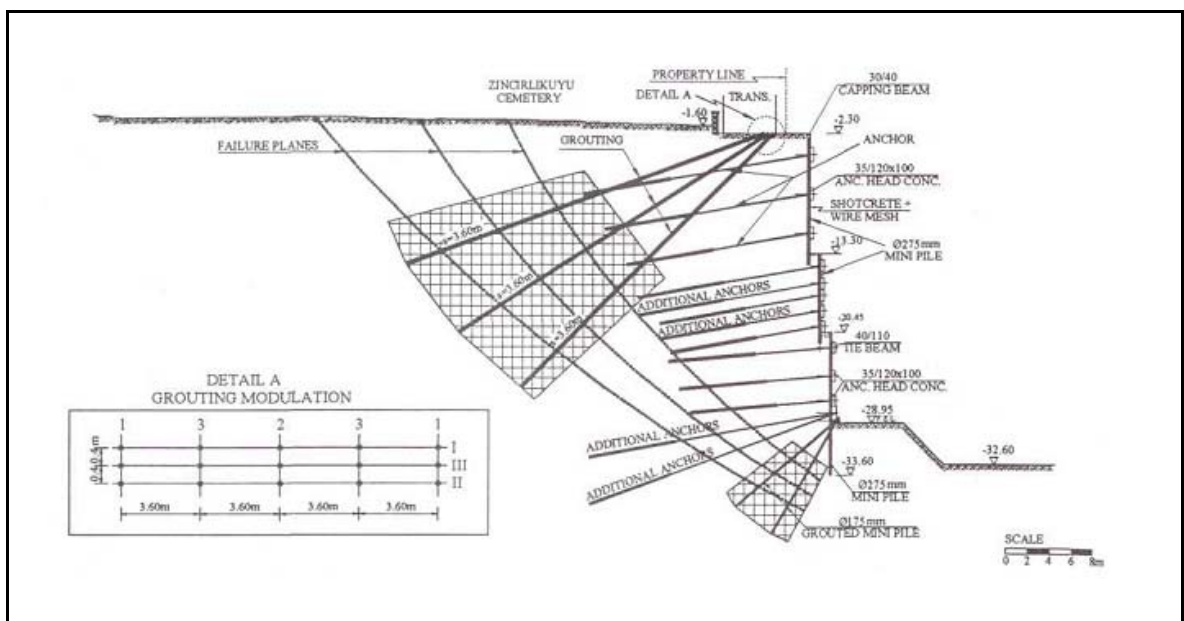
Micro piles with pre-stressed anchors and jet grouting behind applied for the deep excavation of Metrocity Center (Candogan and Duzceer, 2001)
